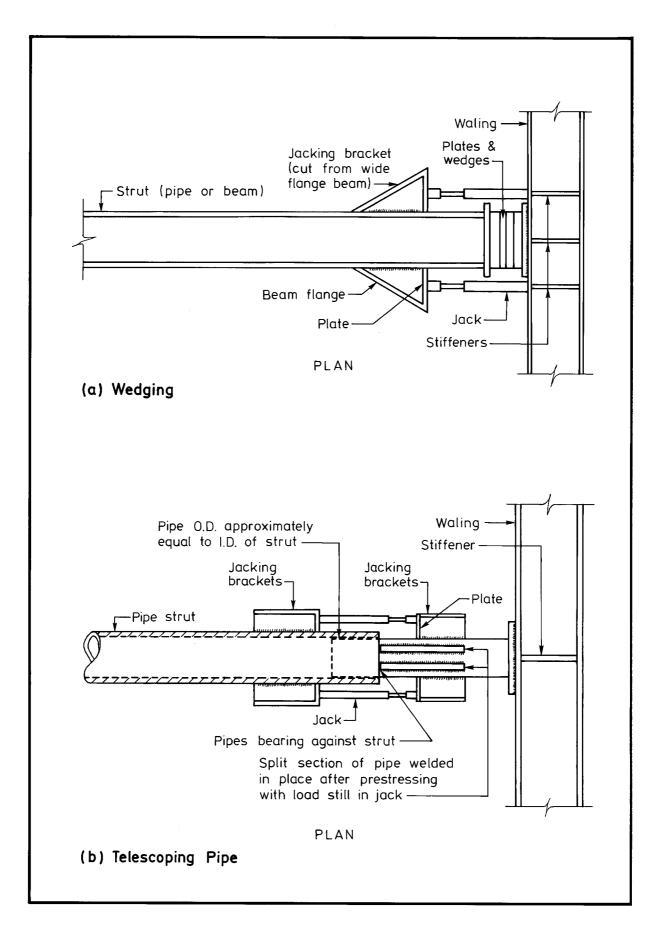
Prestressing Details for Struts (Goldberg et al, 1976)
